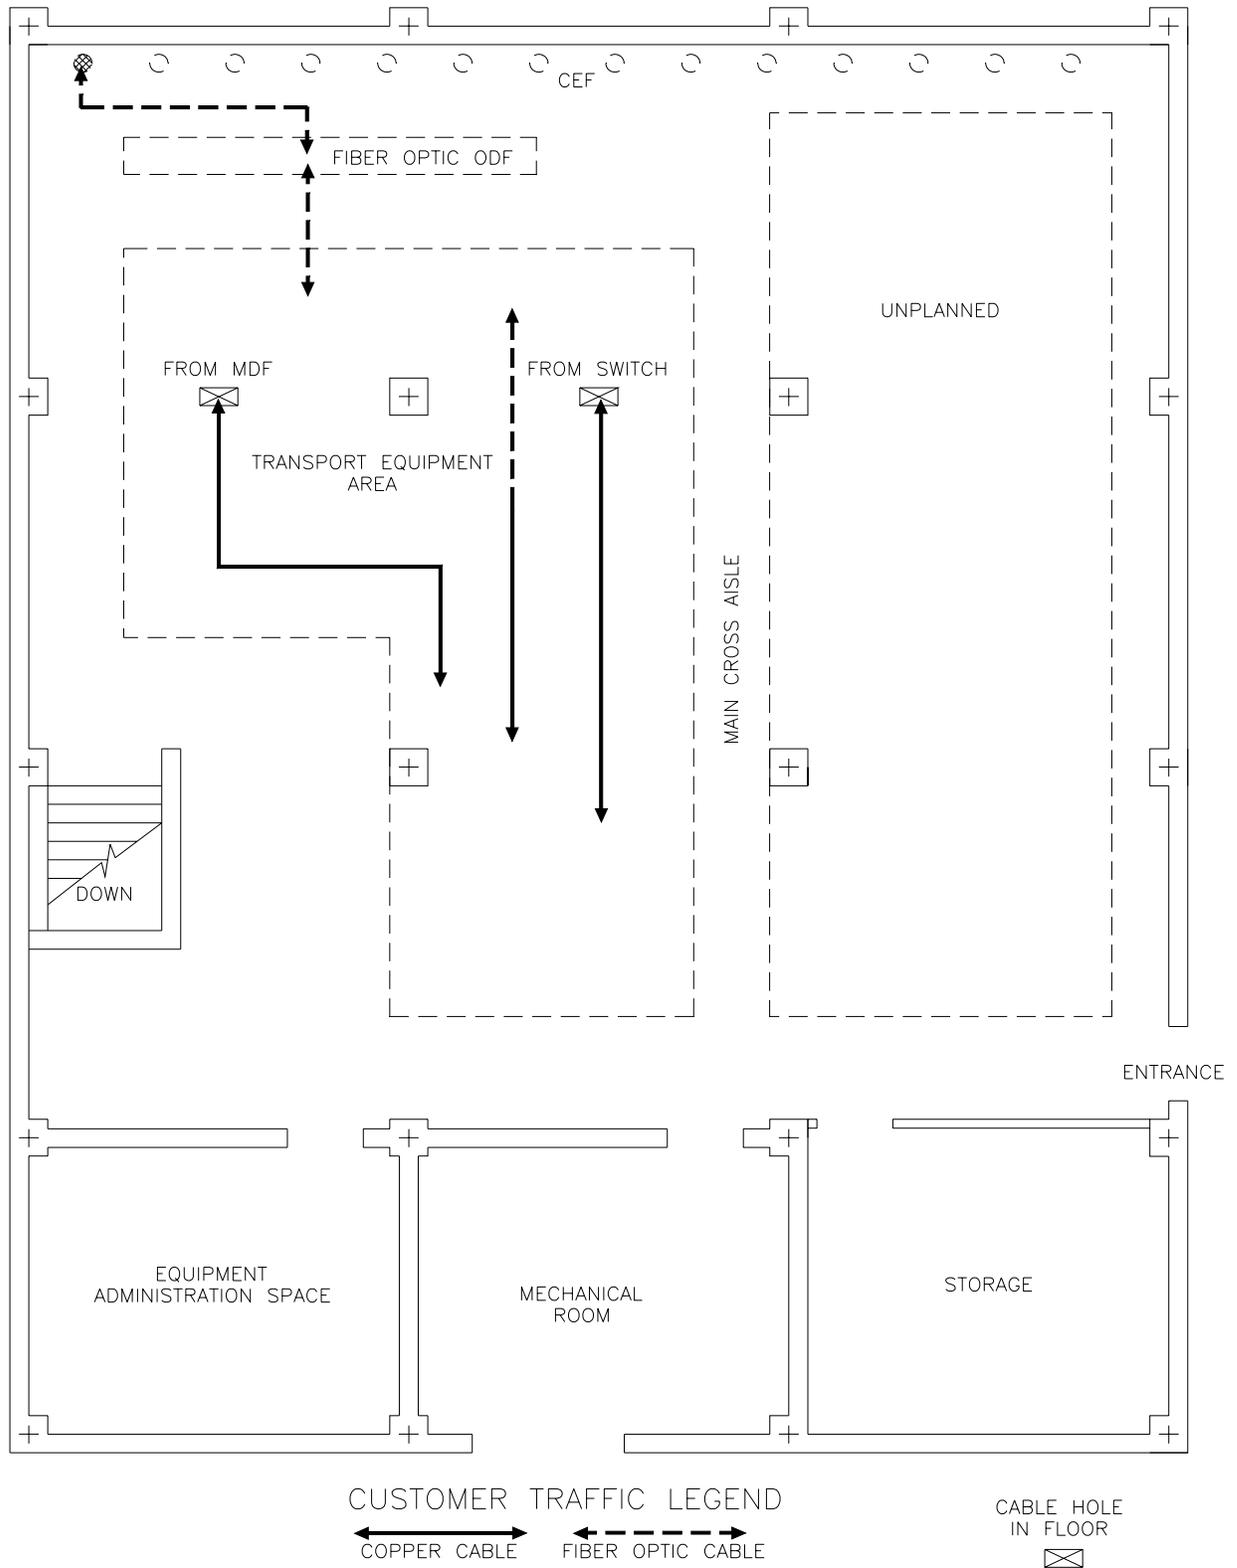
Generic Model Of Multi-Story Network Equipment Building
